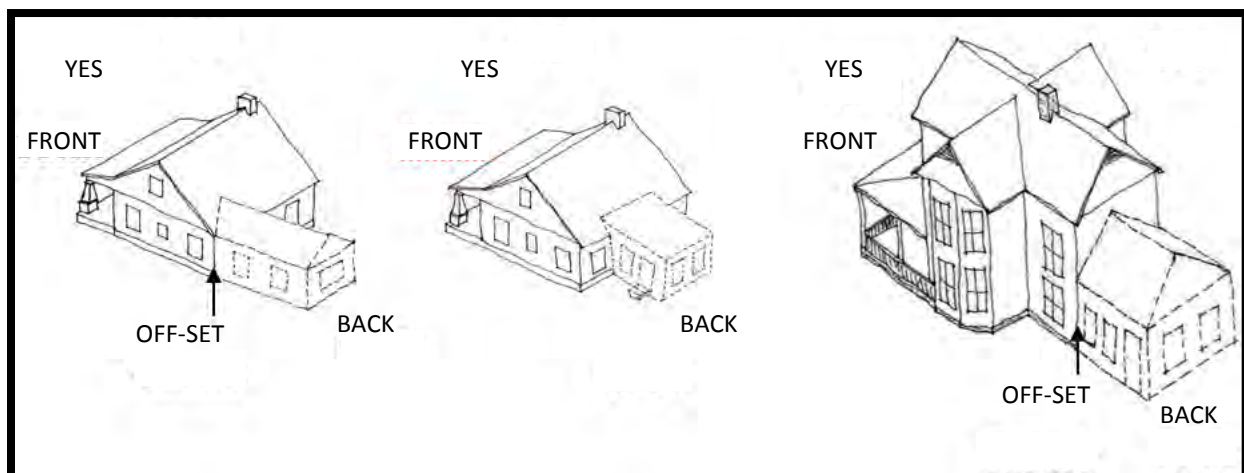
ADDITIONS SHOULD BE LOCATED ON THE BACK ELEVATION AND SHOULD COMPLEMENT THE ORIGINAL BUILDING IN BOTH SIZE AND SCALE.
